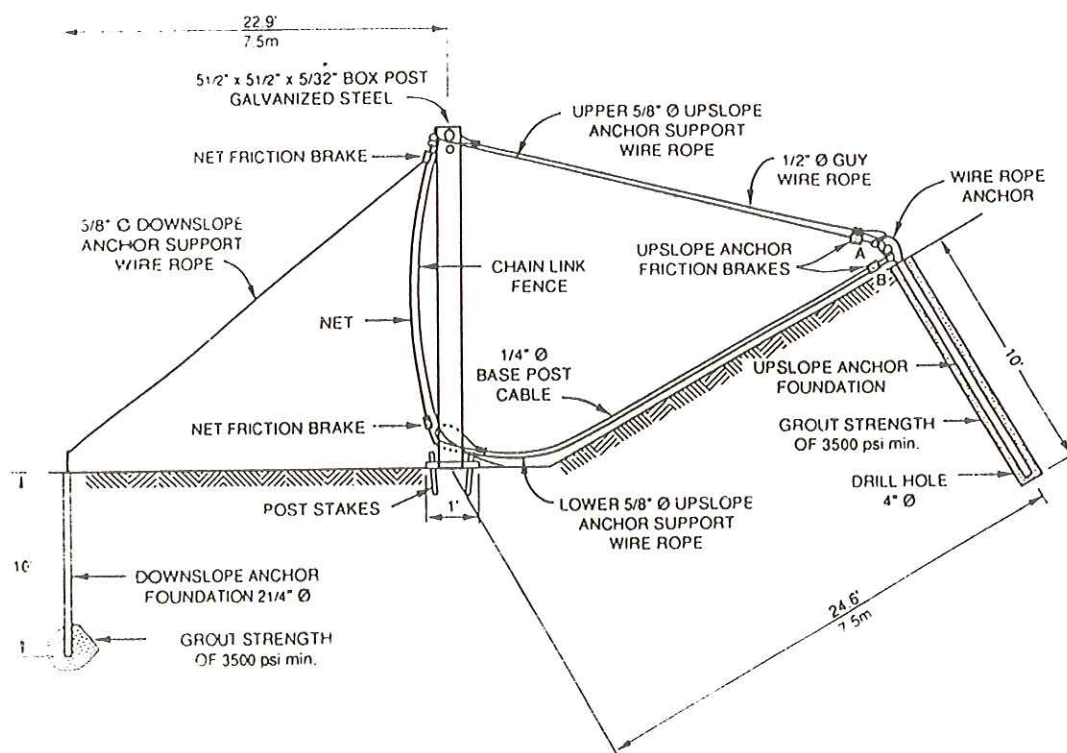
Brugg Rock Net installed with cables to a buried anchor
